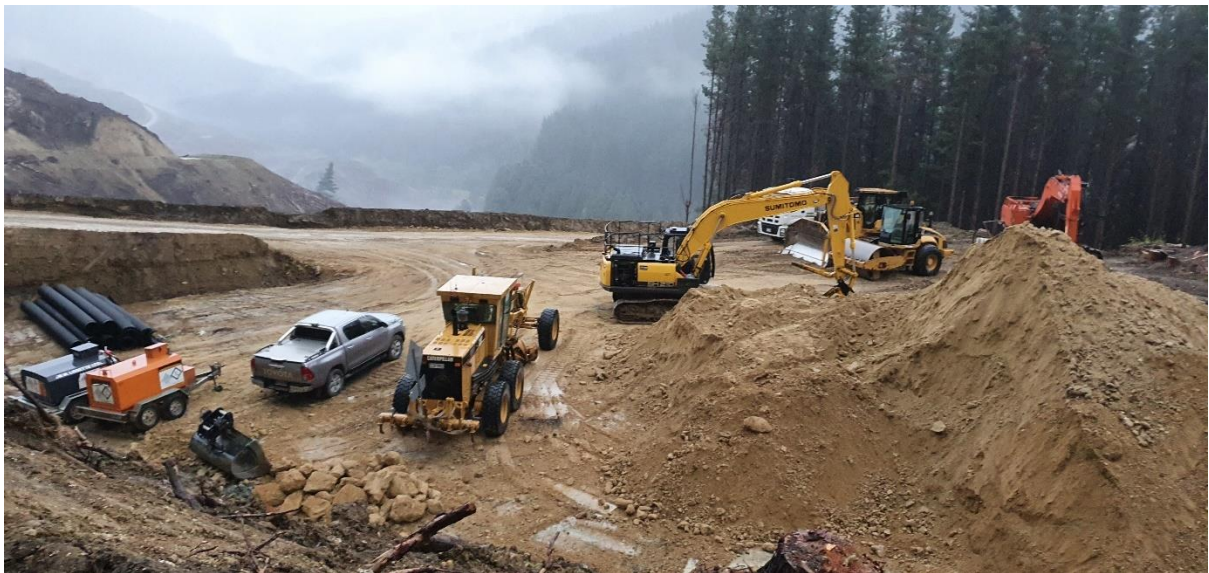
Earthworks machinery at the stockpile on Aitken Road.
